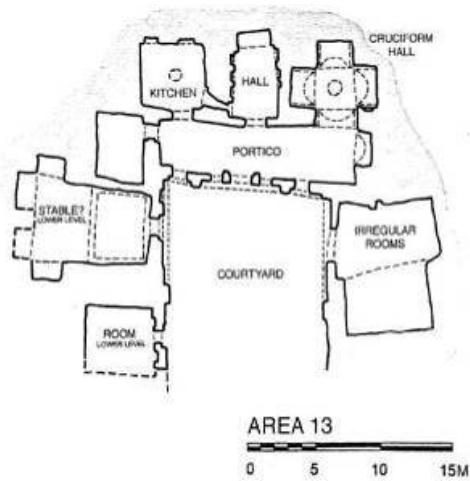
Plan of Area 13. (Ousterhout 2005: 371, Fig. 155).
